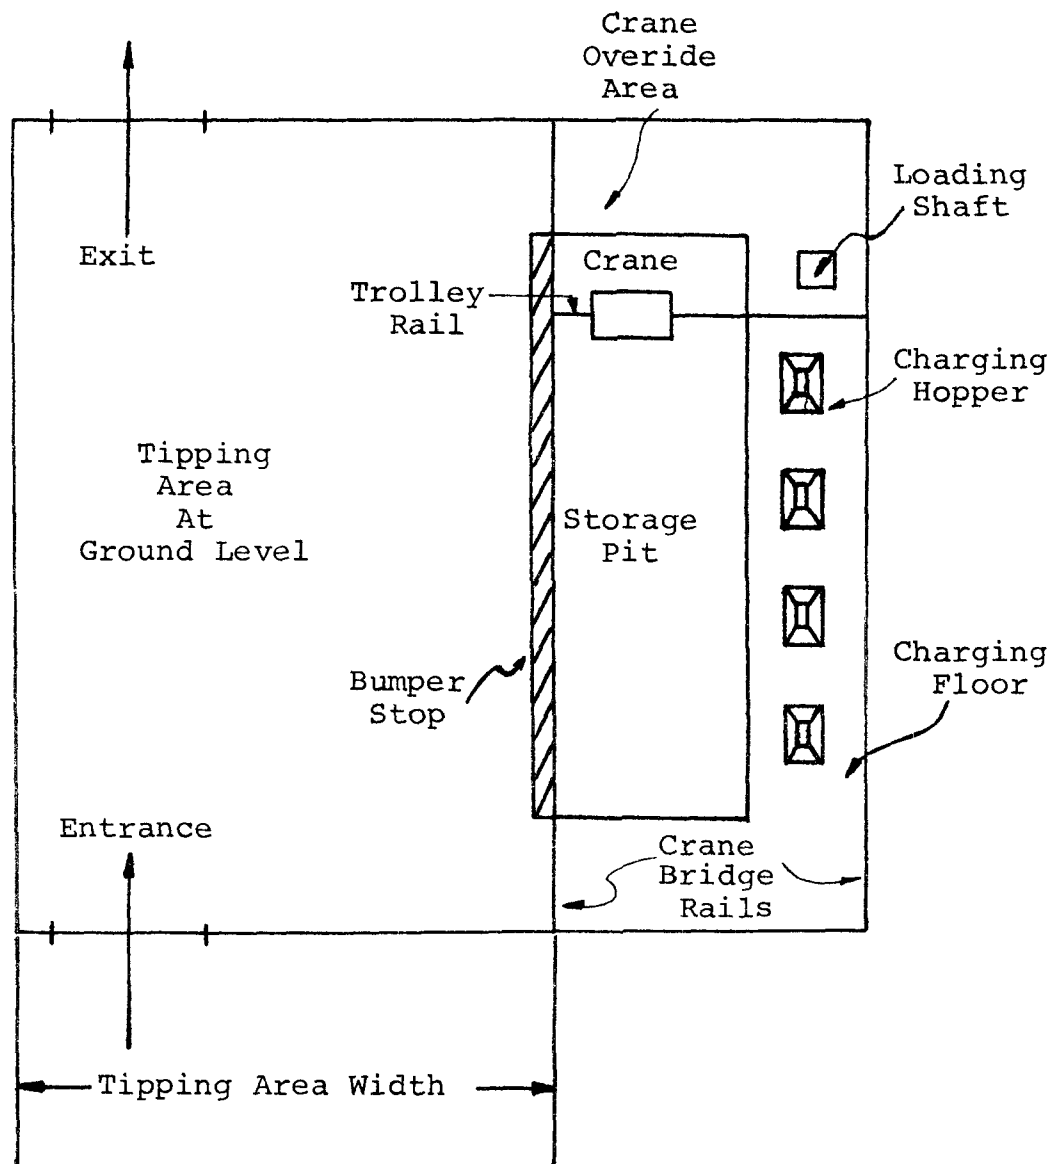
PLAN OF TIPPING AREA AND STORAGE PITS WITH CRANE
